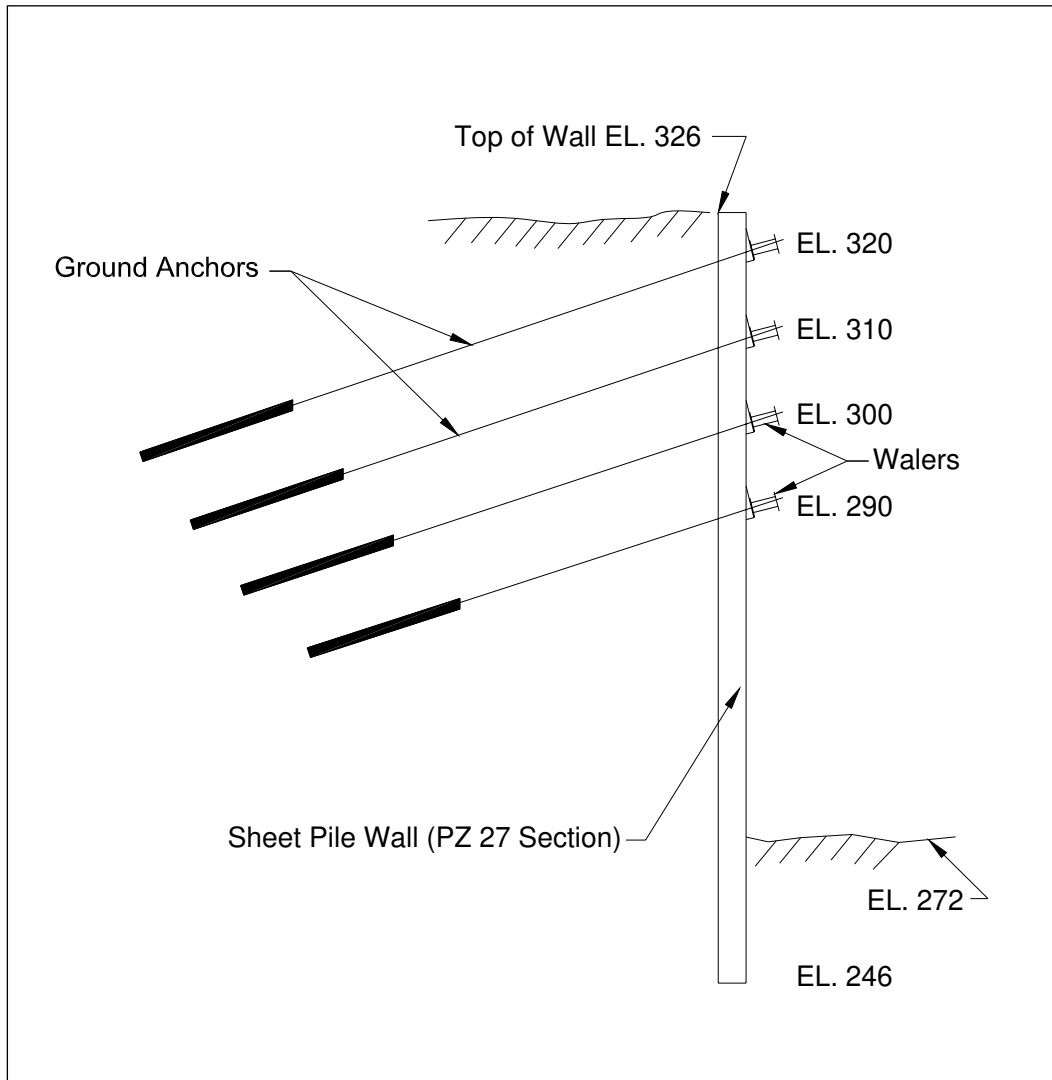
Vertical sheet-pile system with post-tensioned tieback anchors (per Olmstead Prototype wall and after Strom and Ebeling 2001)
